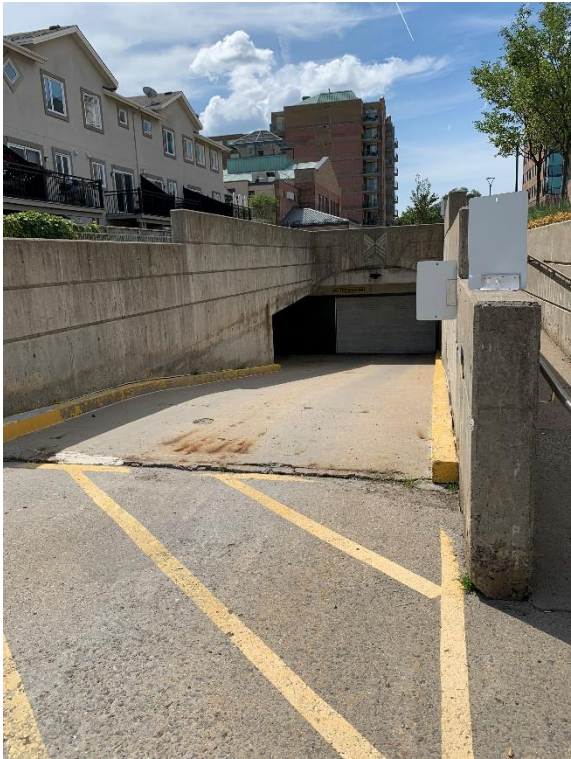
Parking Entrance (South of the Phase One Property) - Facing West
